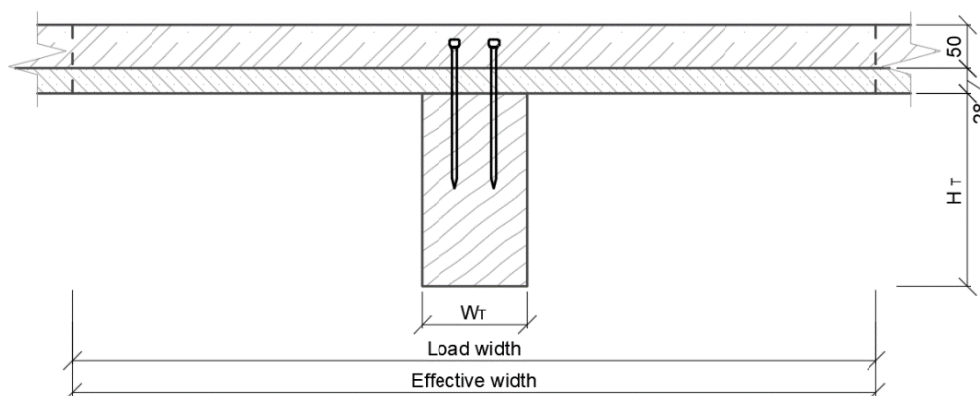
Cross-section of composite beam timber-concrete ceiling.
